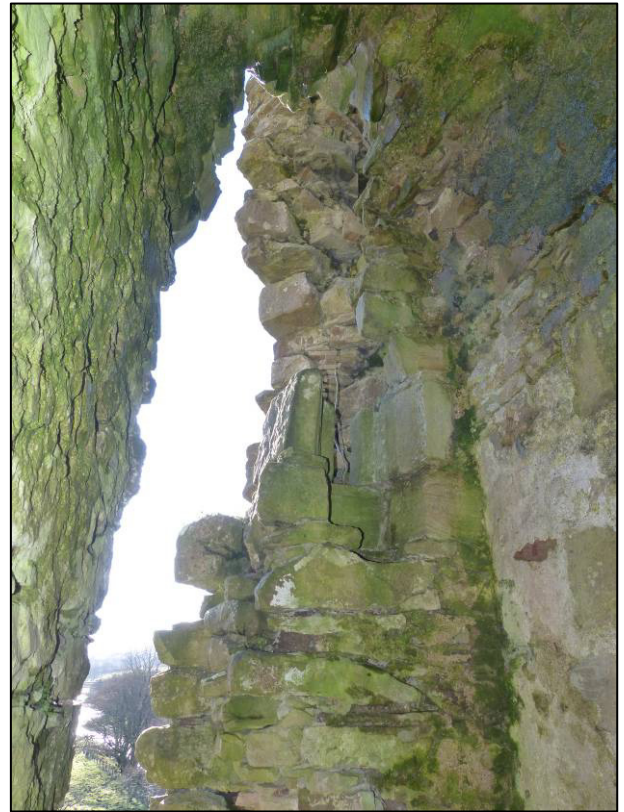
Pendragon Castle, interior of south-west chamber, garderobe, looking S (photo 9/591).
